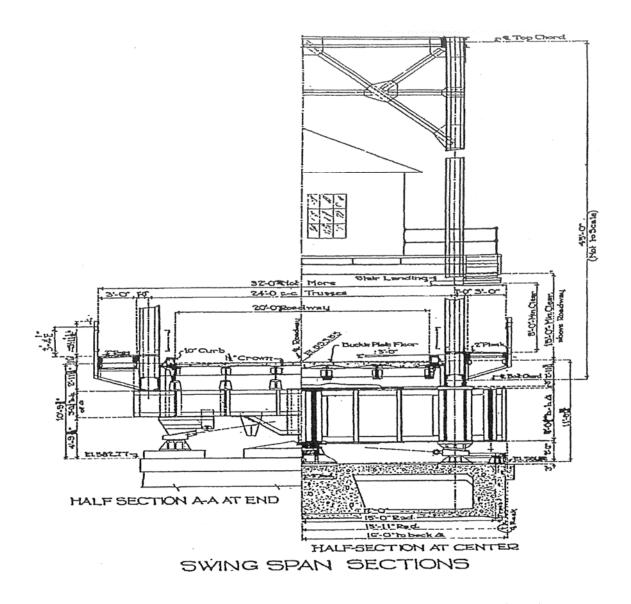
Cross Section of 1929 rehabilitation of existing 1873 pivot pier (Pier 9)
